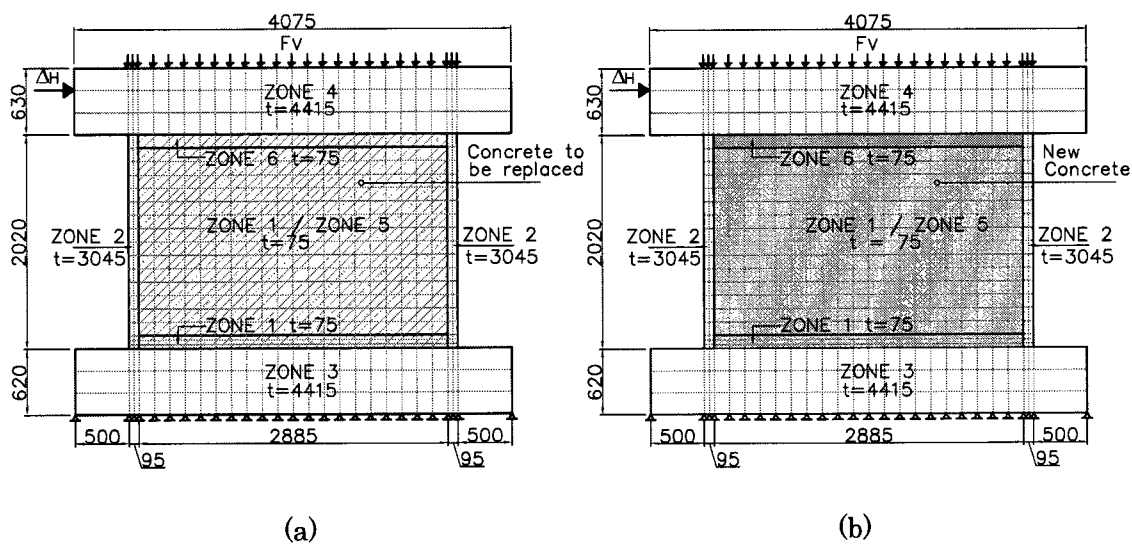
Finite Element Mesh of Walls: (a) DP1; (b) DP1R. All Dimensions in mm
